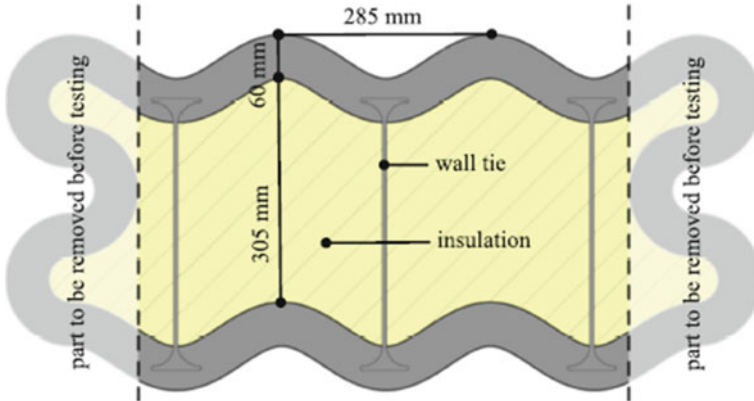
Cross-section of the wall (Bos et al. 2019)
